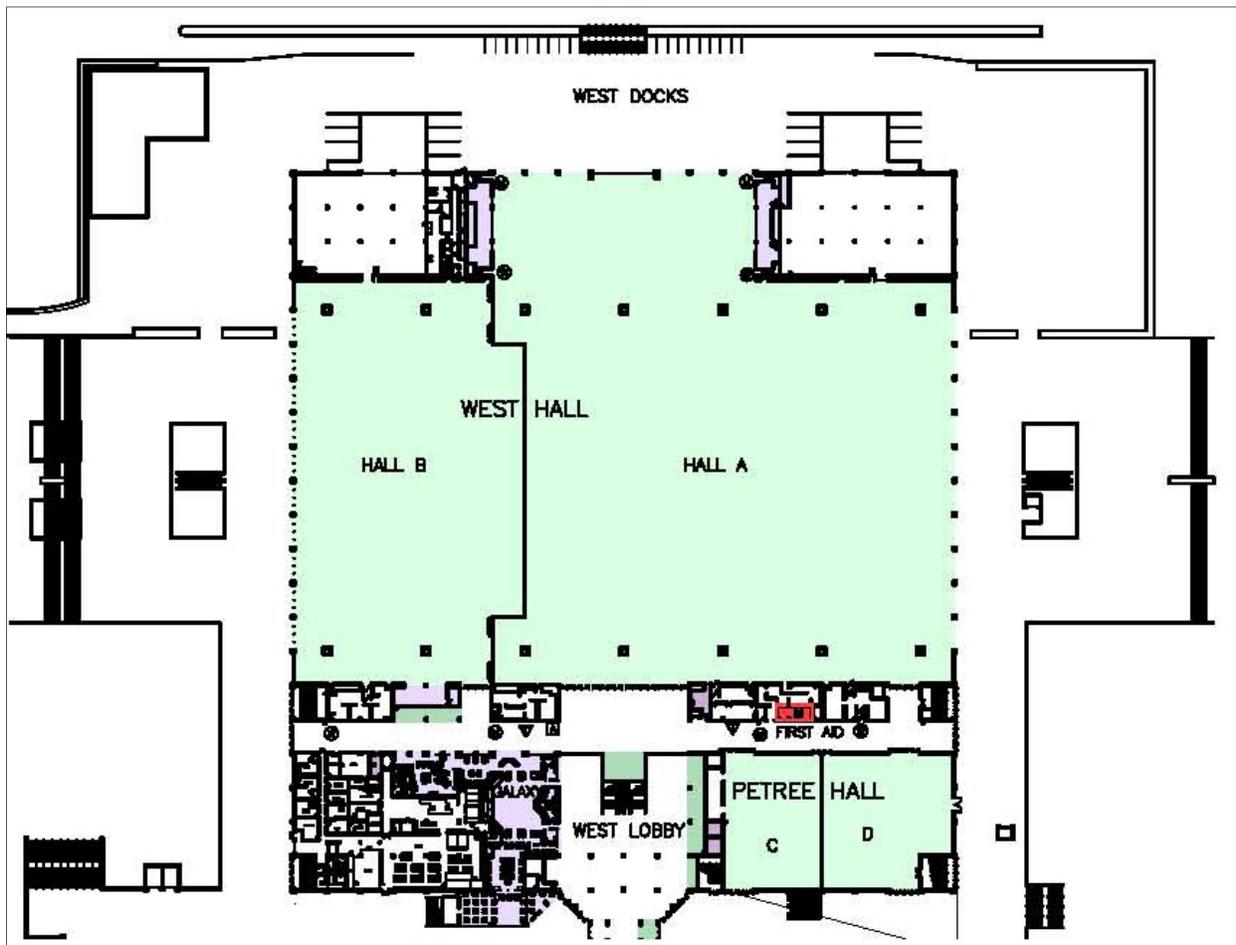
West Hall first floor plan (Los Angeles Convention Center, 2011)
